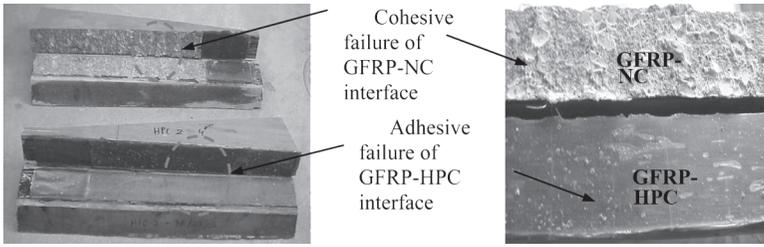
Typical fracture surfaces of GFRP-NC and GFRP-HPC specimens after dry fracture test
